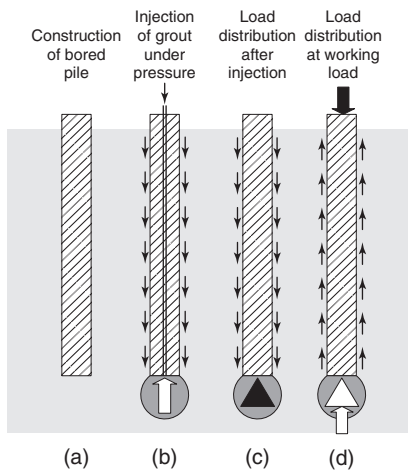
Installation of bored piles: Base grouting (After Brown et al. 2010).
